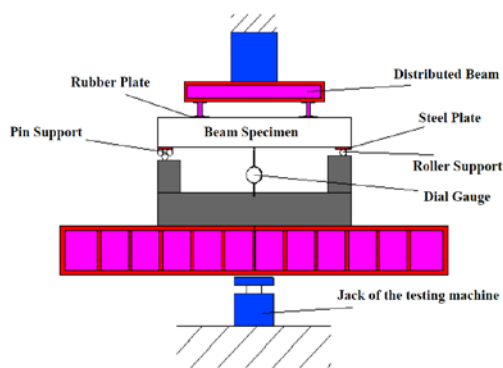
Beams Testing Machine Details<sup>(21)</sup>
